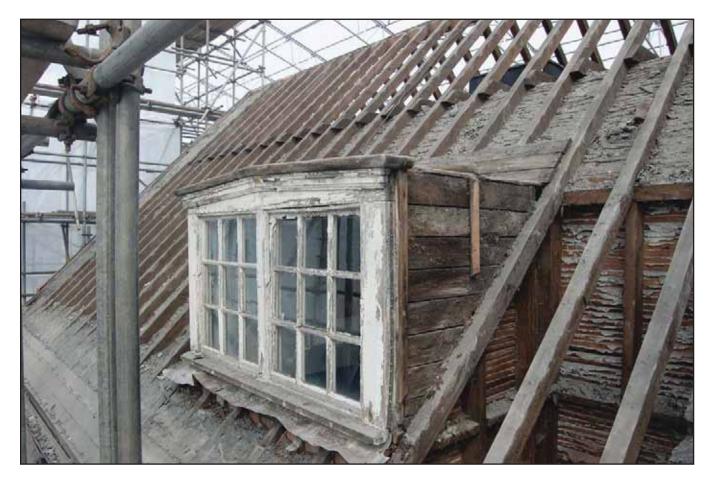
Old Grammar School External- view west of roof during renovation: dormer light detail
